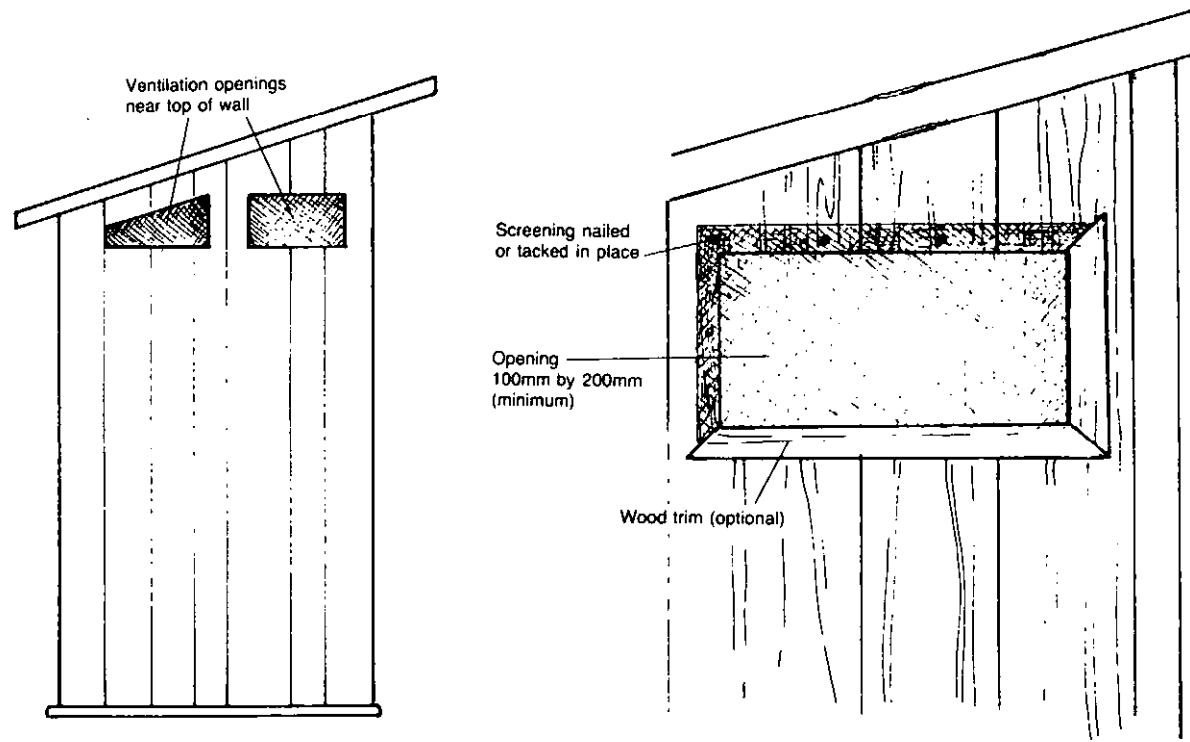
Fly-Proof Screening Covering Ventilation Openings
